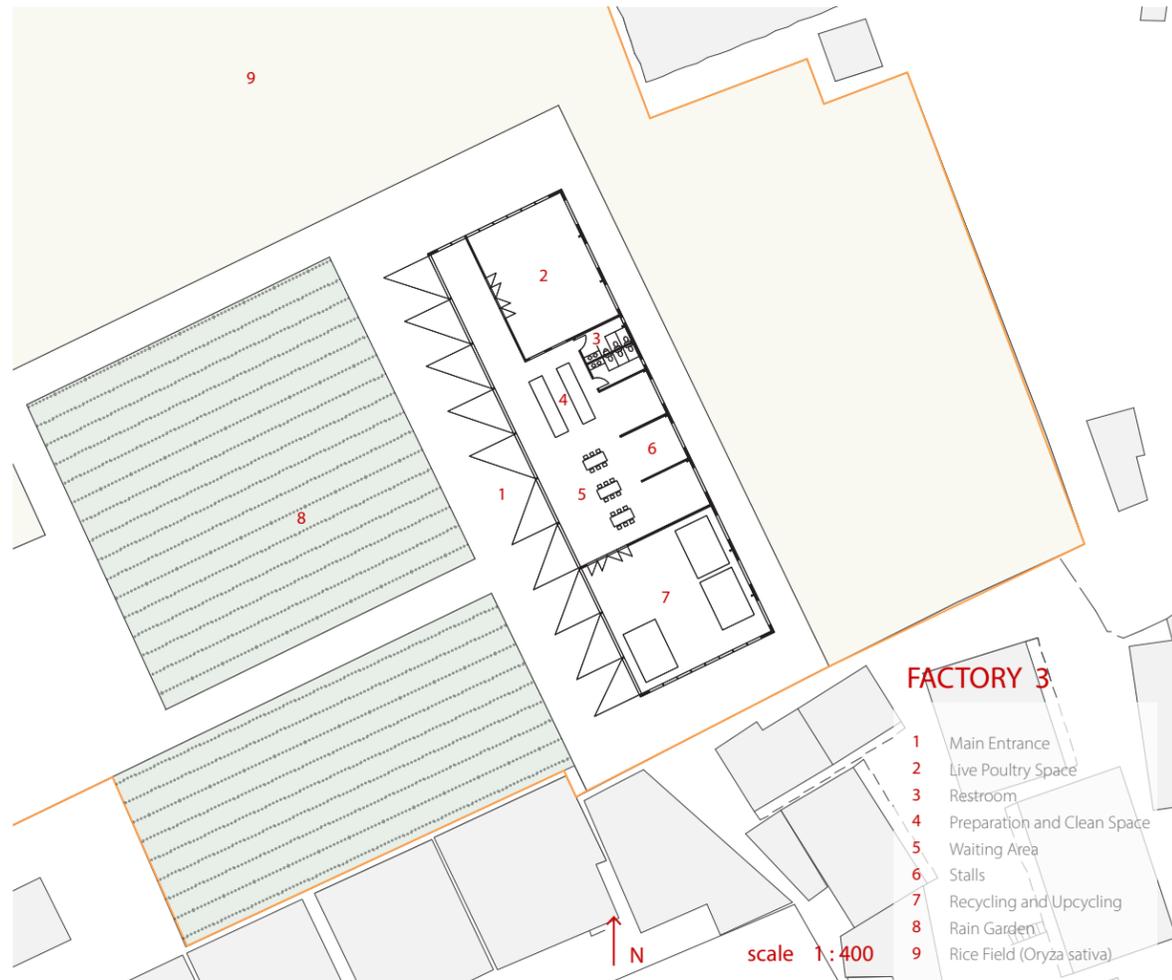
Proposed Floor Plan of Factory 3, photo by author
